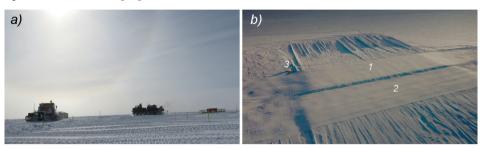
Fragment of the foundations slab for the new buildings of the Vostok Station (a) and the top view (b).
